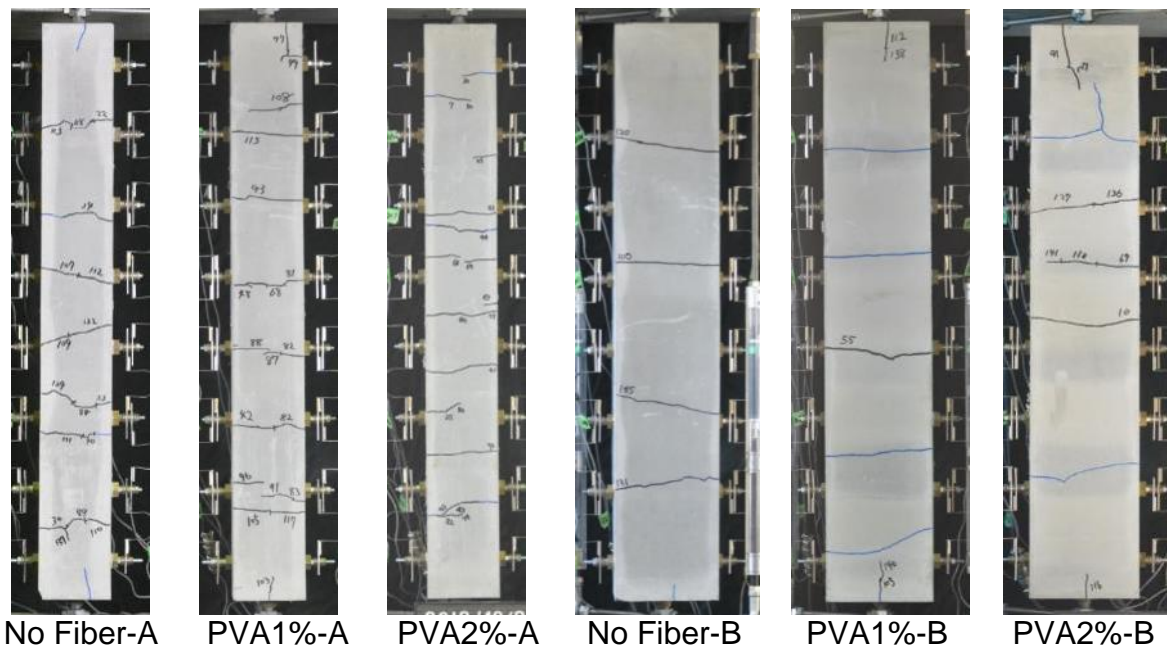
Examples of crack patterns at steel rebar yielding
